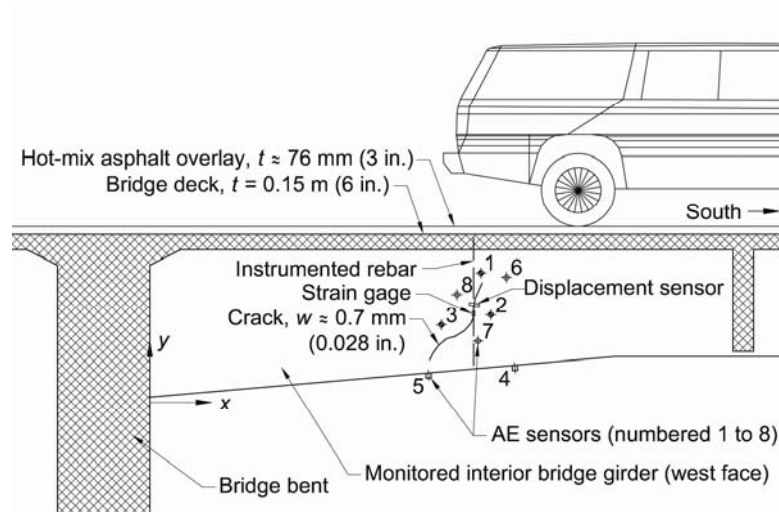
Elevation view of monitored interior girder with sensor locations
